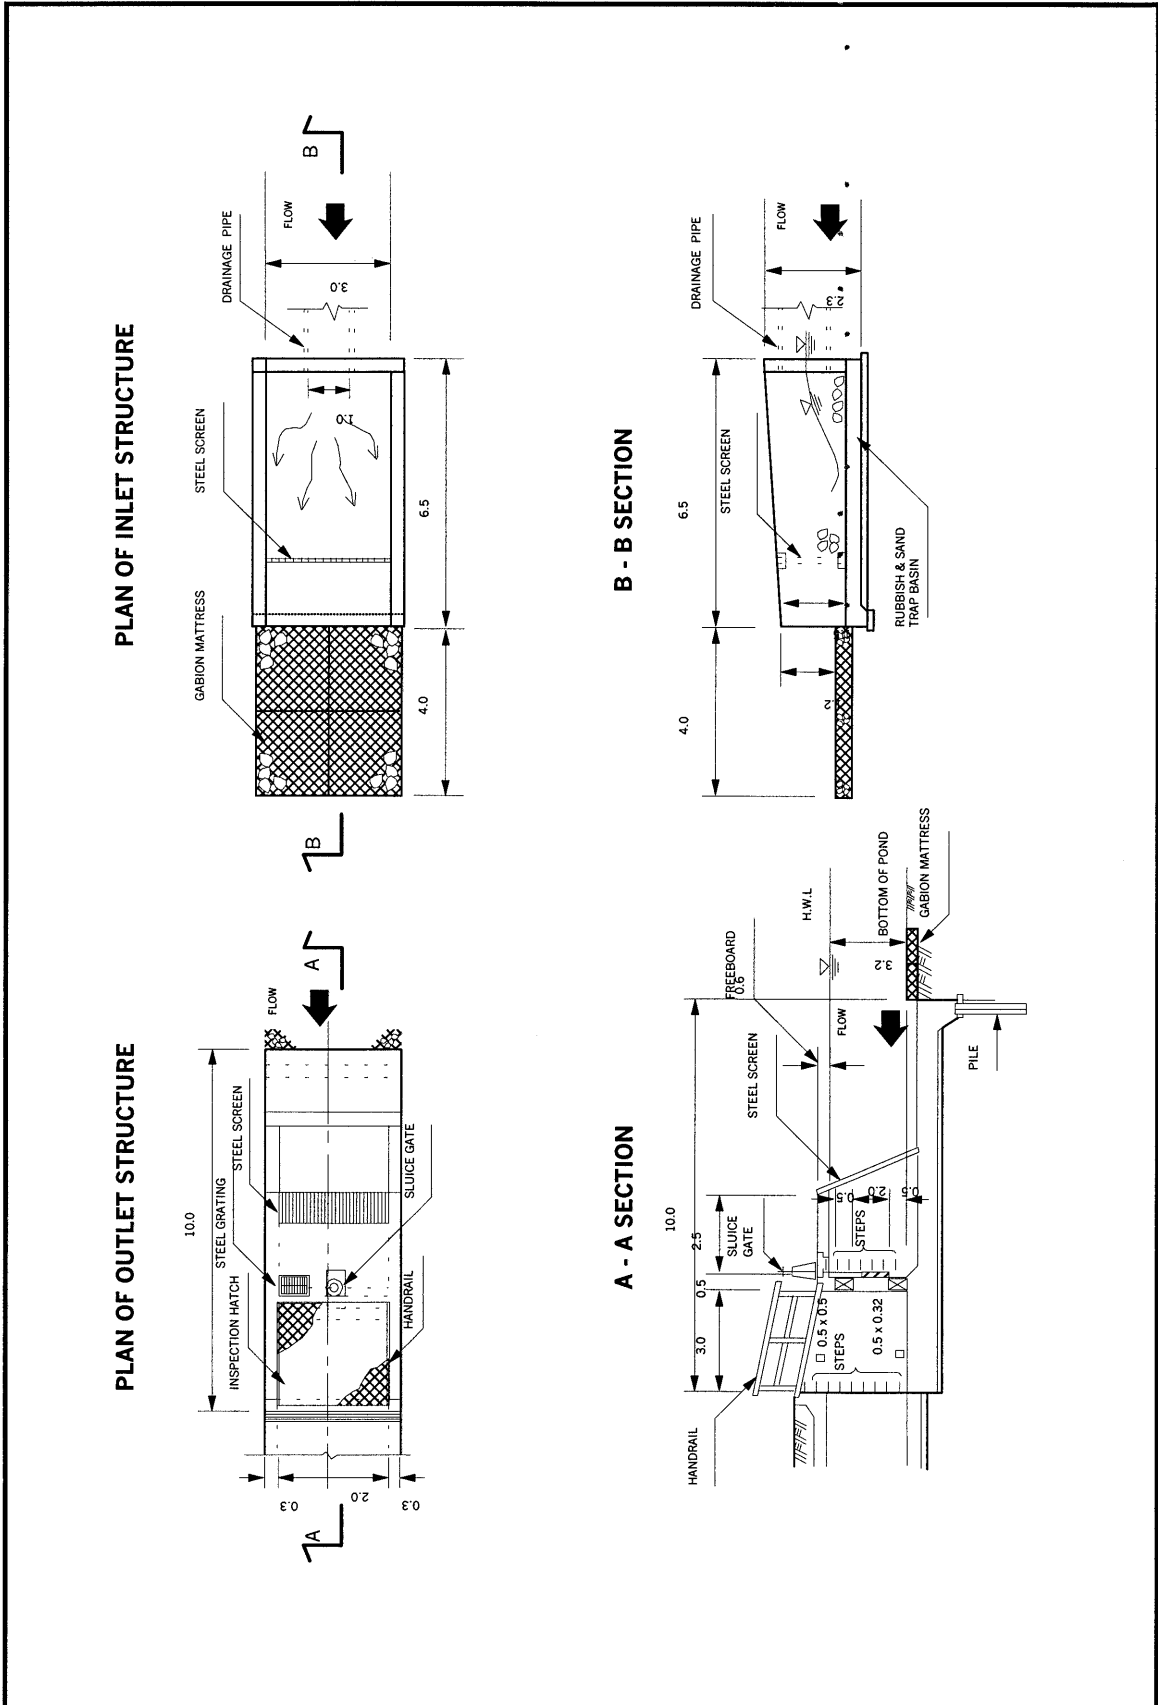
Typical In/Outlet Structure of Detention Pond
